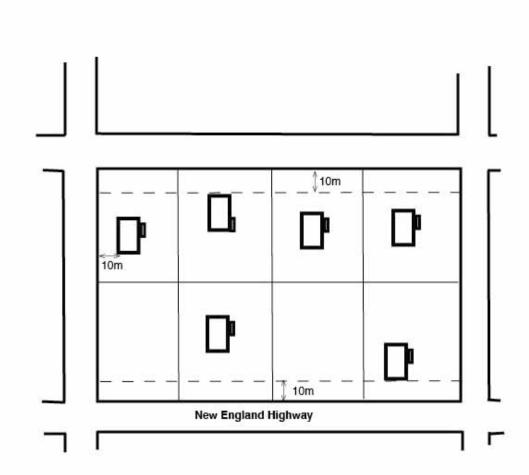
Urban and village residential zones (R1 and RU5) – minimum building setbacks to boundary (building lines)
